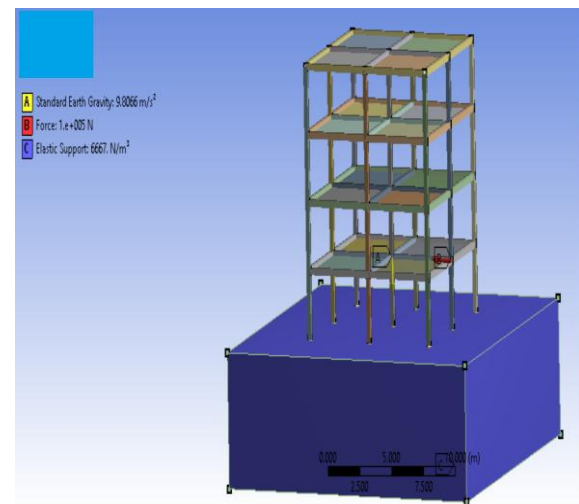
Extruded model of the building frame resting on piles in contact with the soil
